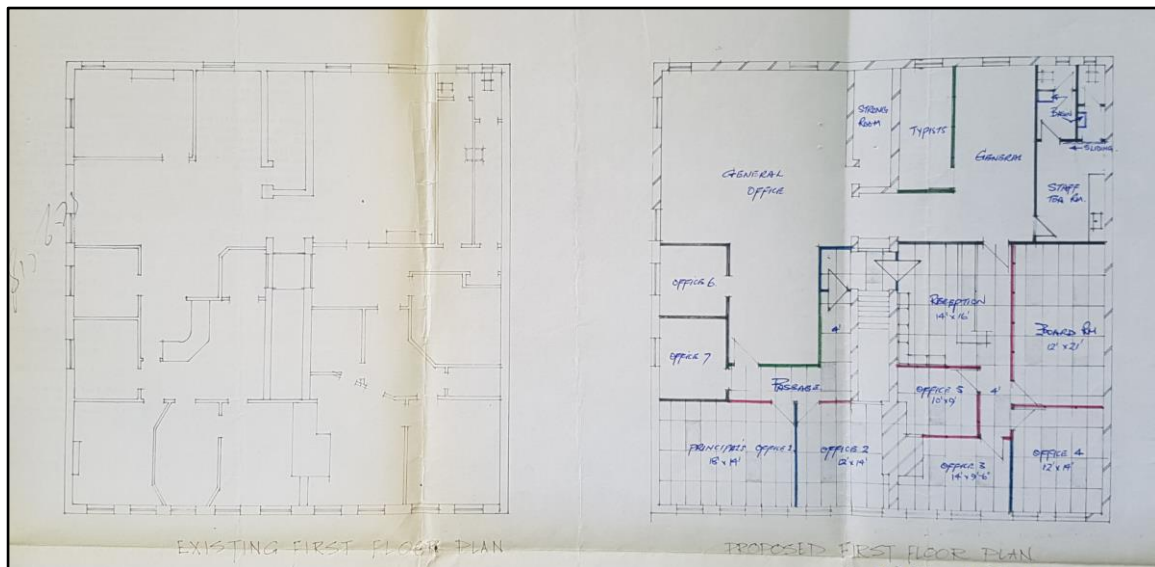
Details from 1973 plan of the Temple Chambers at 45-49 Esk Street, showing the existing first floor plan (left) and the alterations to first floor plan (right) (V. R. Jackson, 1973).
